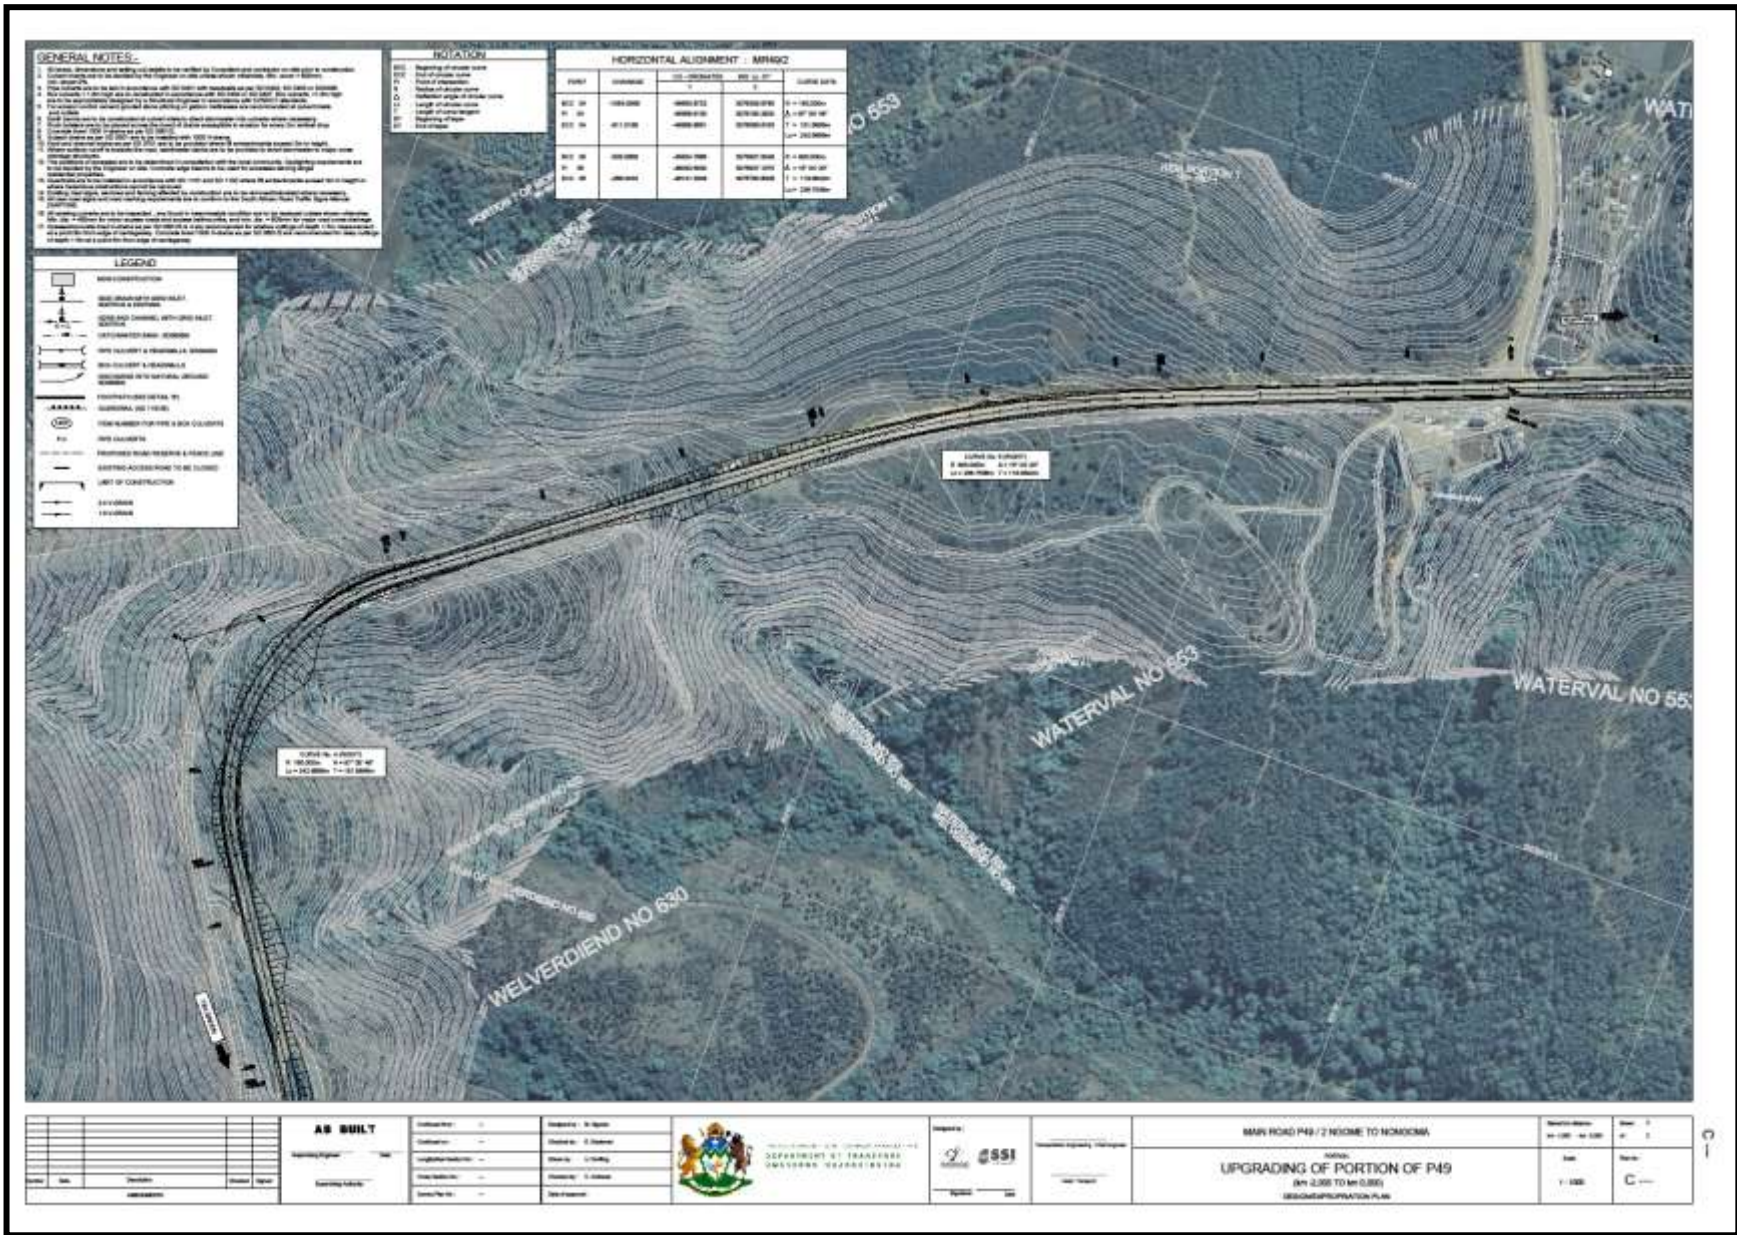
PLAN OF ROAD WIDENING 1 – 2 KM
